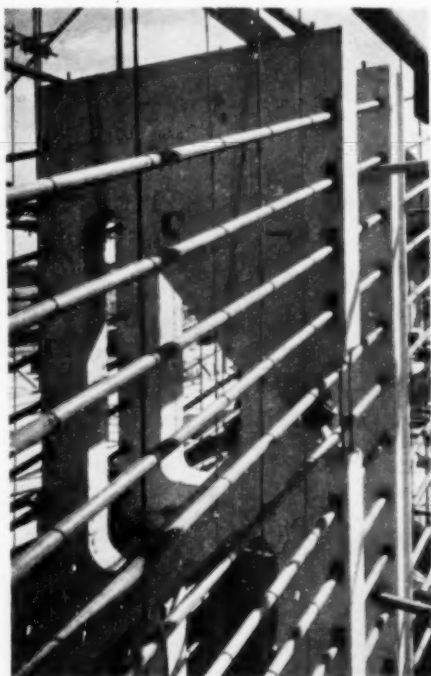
Precast Diaphragms for Main Beams, with Cables in Position.
